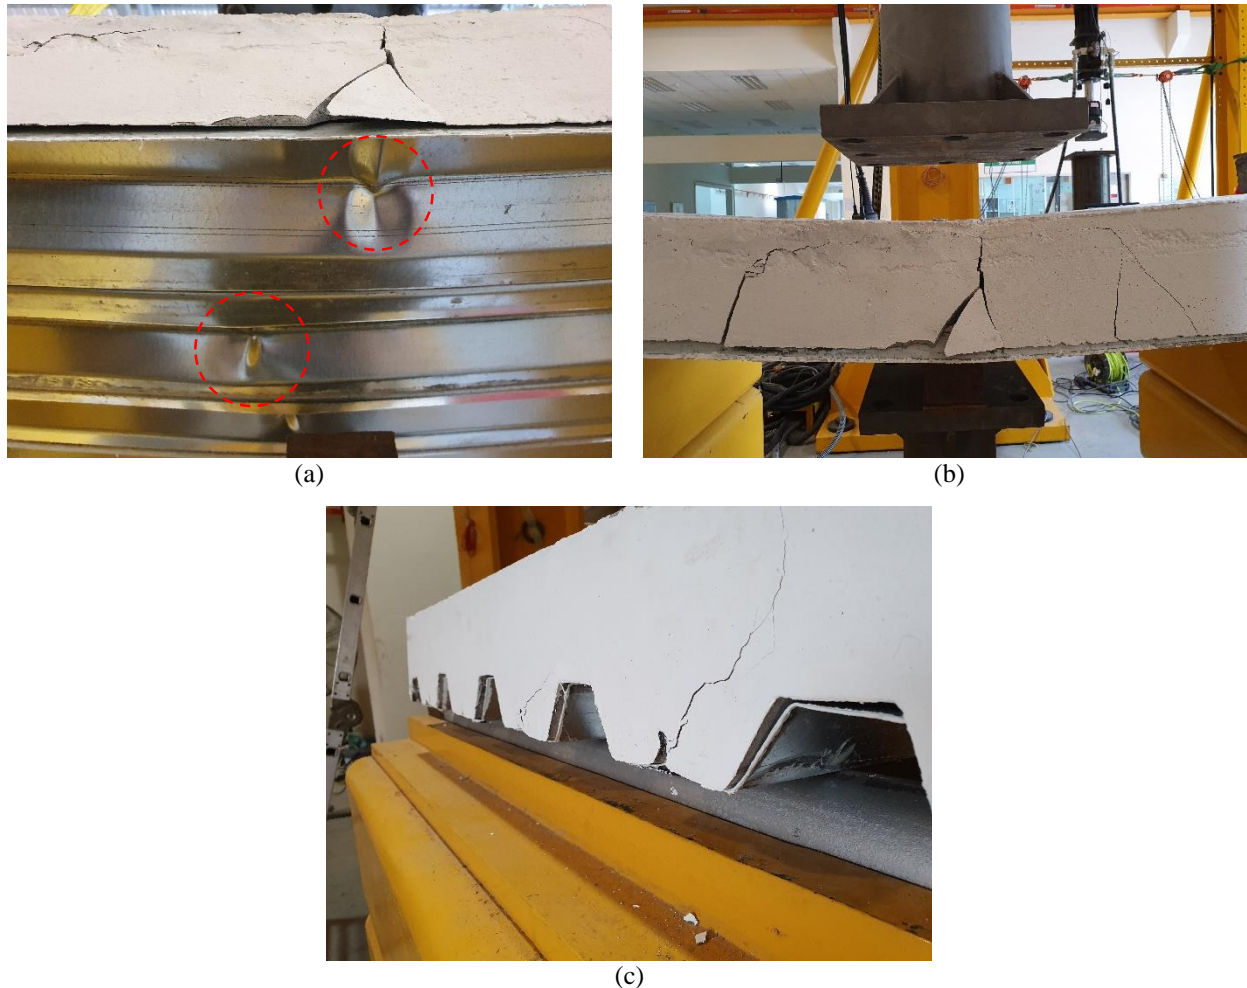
Failure mode; (a) yielding of corrugated steel deck; (b) flexural-shear cracks; (c) slip-displacement and diagonal cracks
